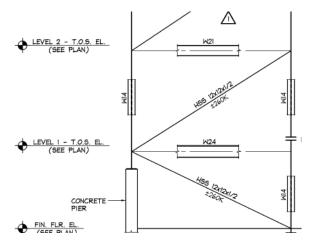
TYPICAL BRACED FRAME COURTESY OF TURNER CONSTRUCTION
